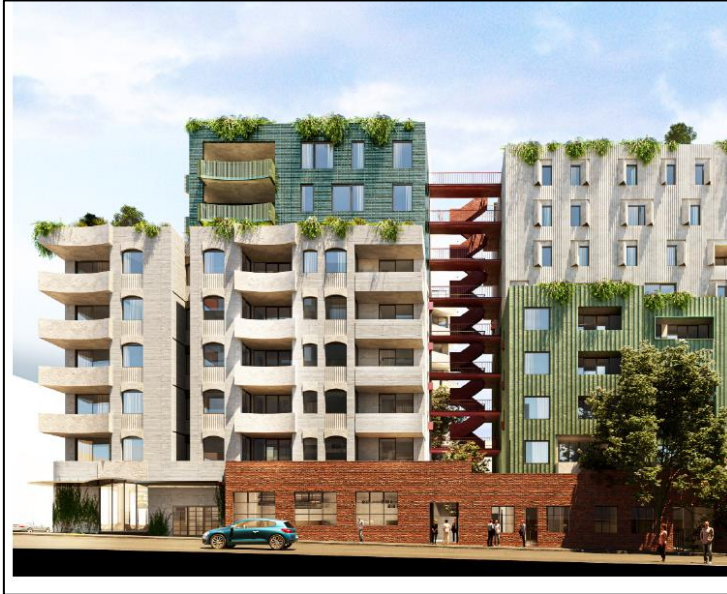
(Gore Street Façade, SJB Architects September 2021)
